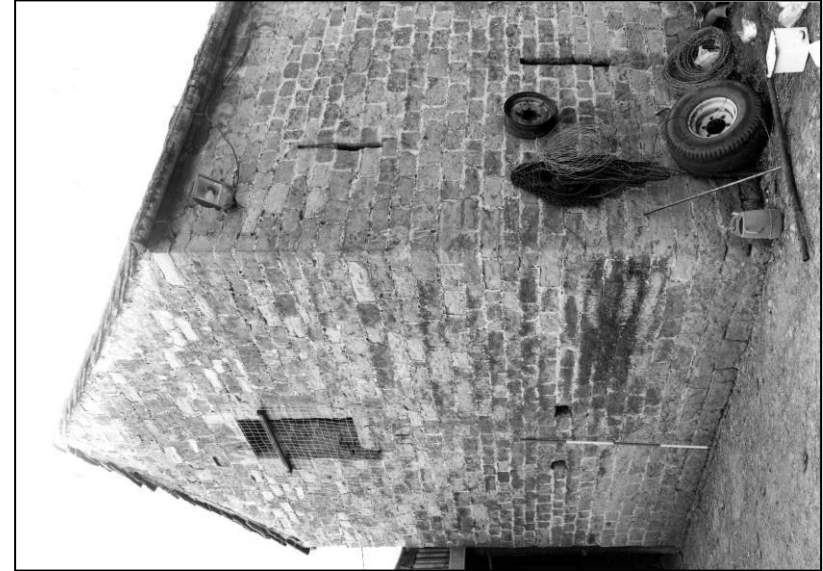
Barn: E gable, looking SW (photo 7/5) (top to left).
